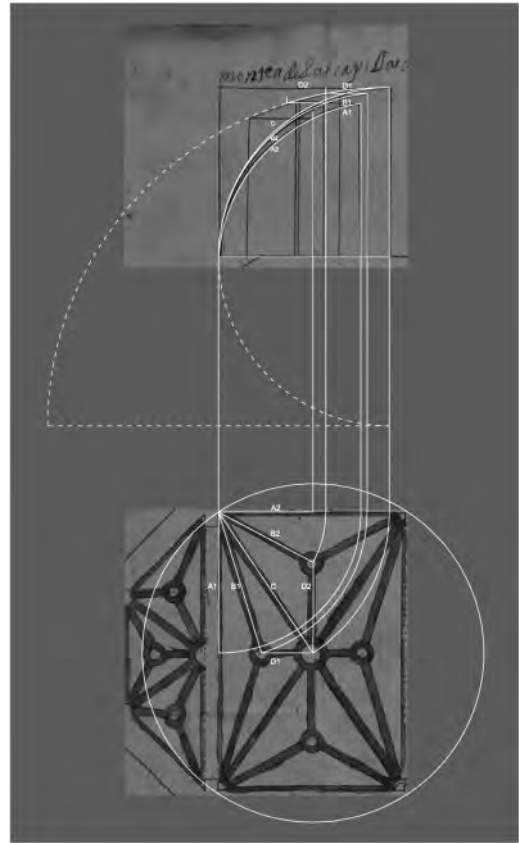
Checking the accuracy of the plan and the elevations of the arches. Drawing by the authors.
